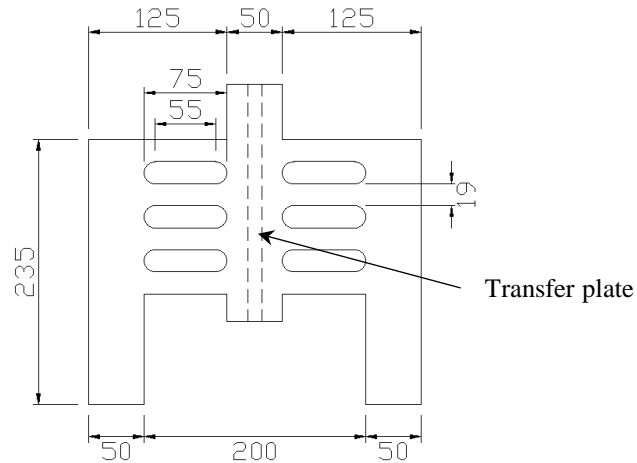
Slit damper for specimen P-SD-0, dimensions in mm.
